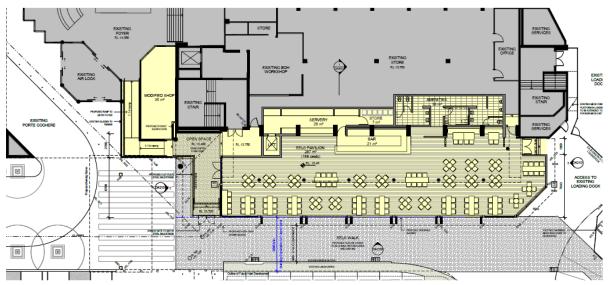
Recently-approved ground floor addition to Parramatta Leagues Club to the north
